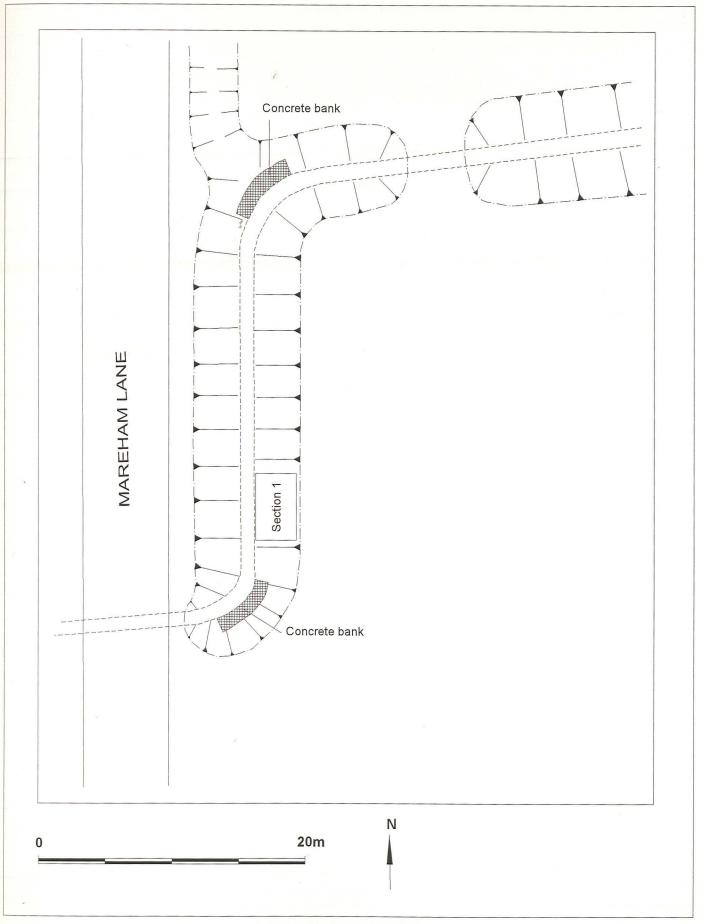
Plan of the drainage works, showing location of Section $\boldsymbol{1}$
